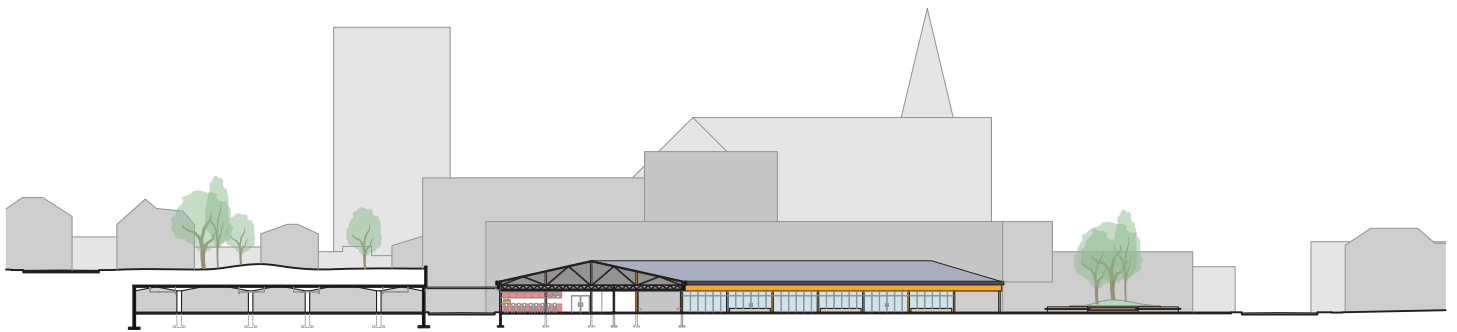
Site section (east-west) facing south (1:1000), showing the relationship between the Galt Place stoa and the surrounding urban condition.
